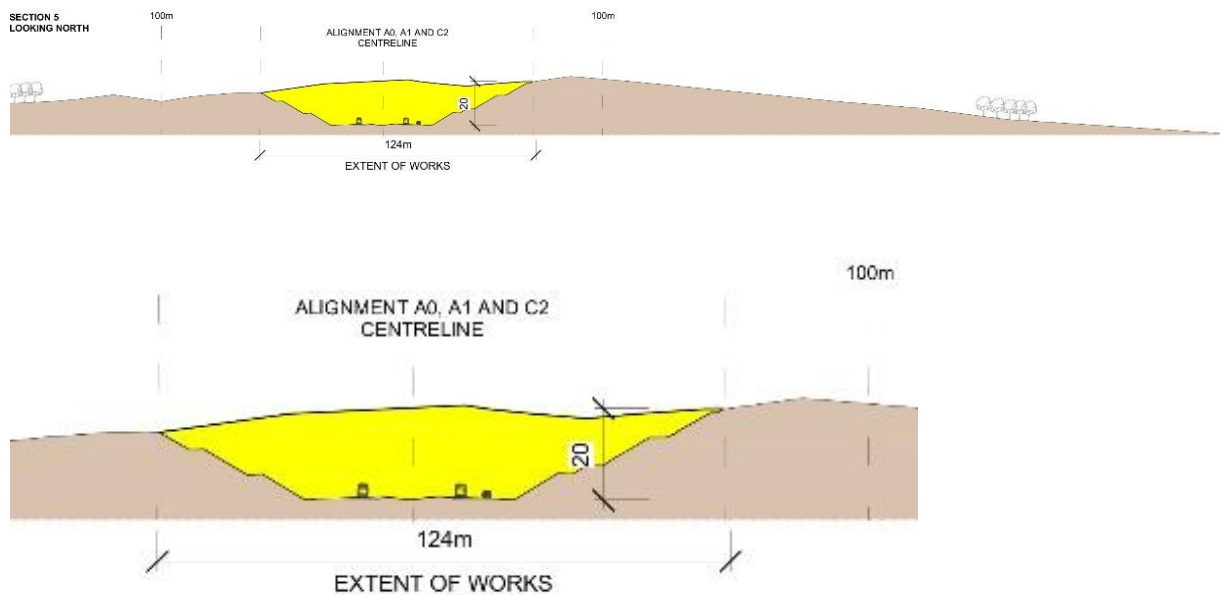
Cross Section No. 5 – Looking north as Alignment cuts through low hill (and close-up section)
